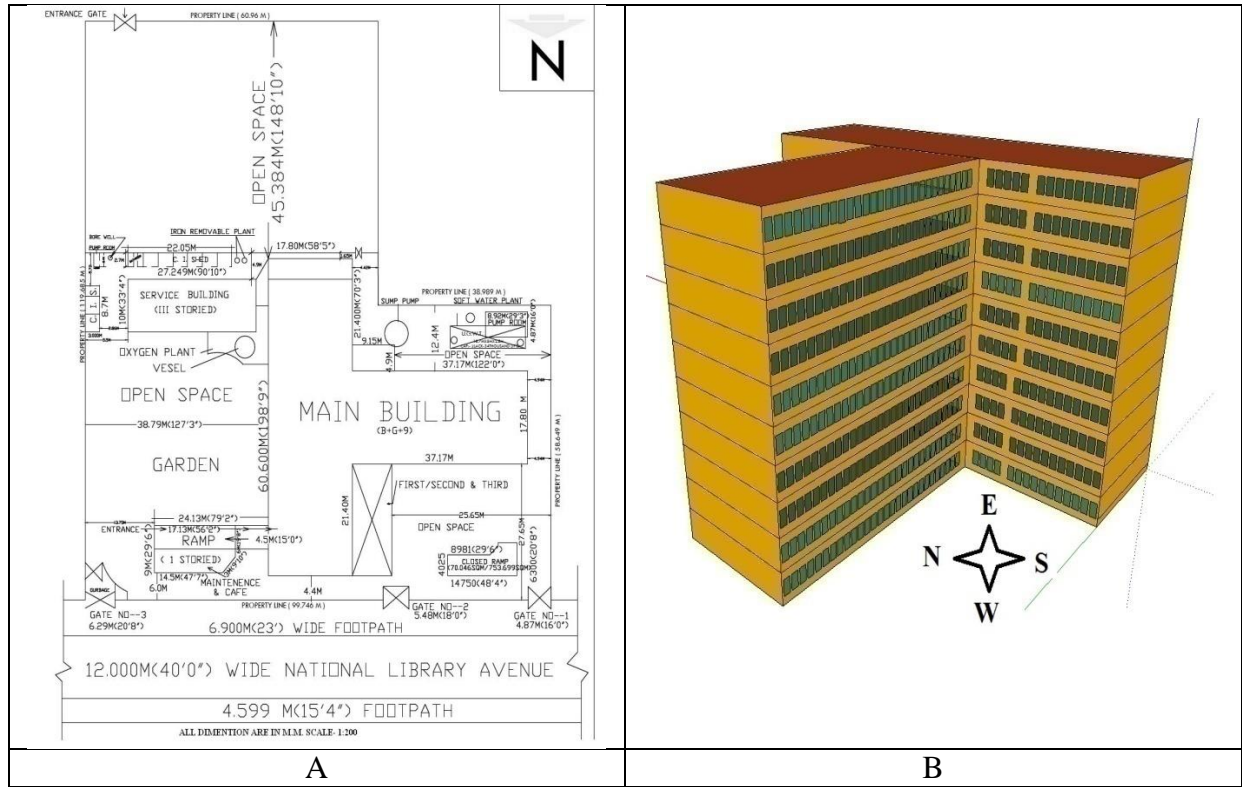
(A) The building Floor plan and (B) 3-D model of the baseline house model
